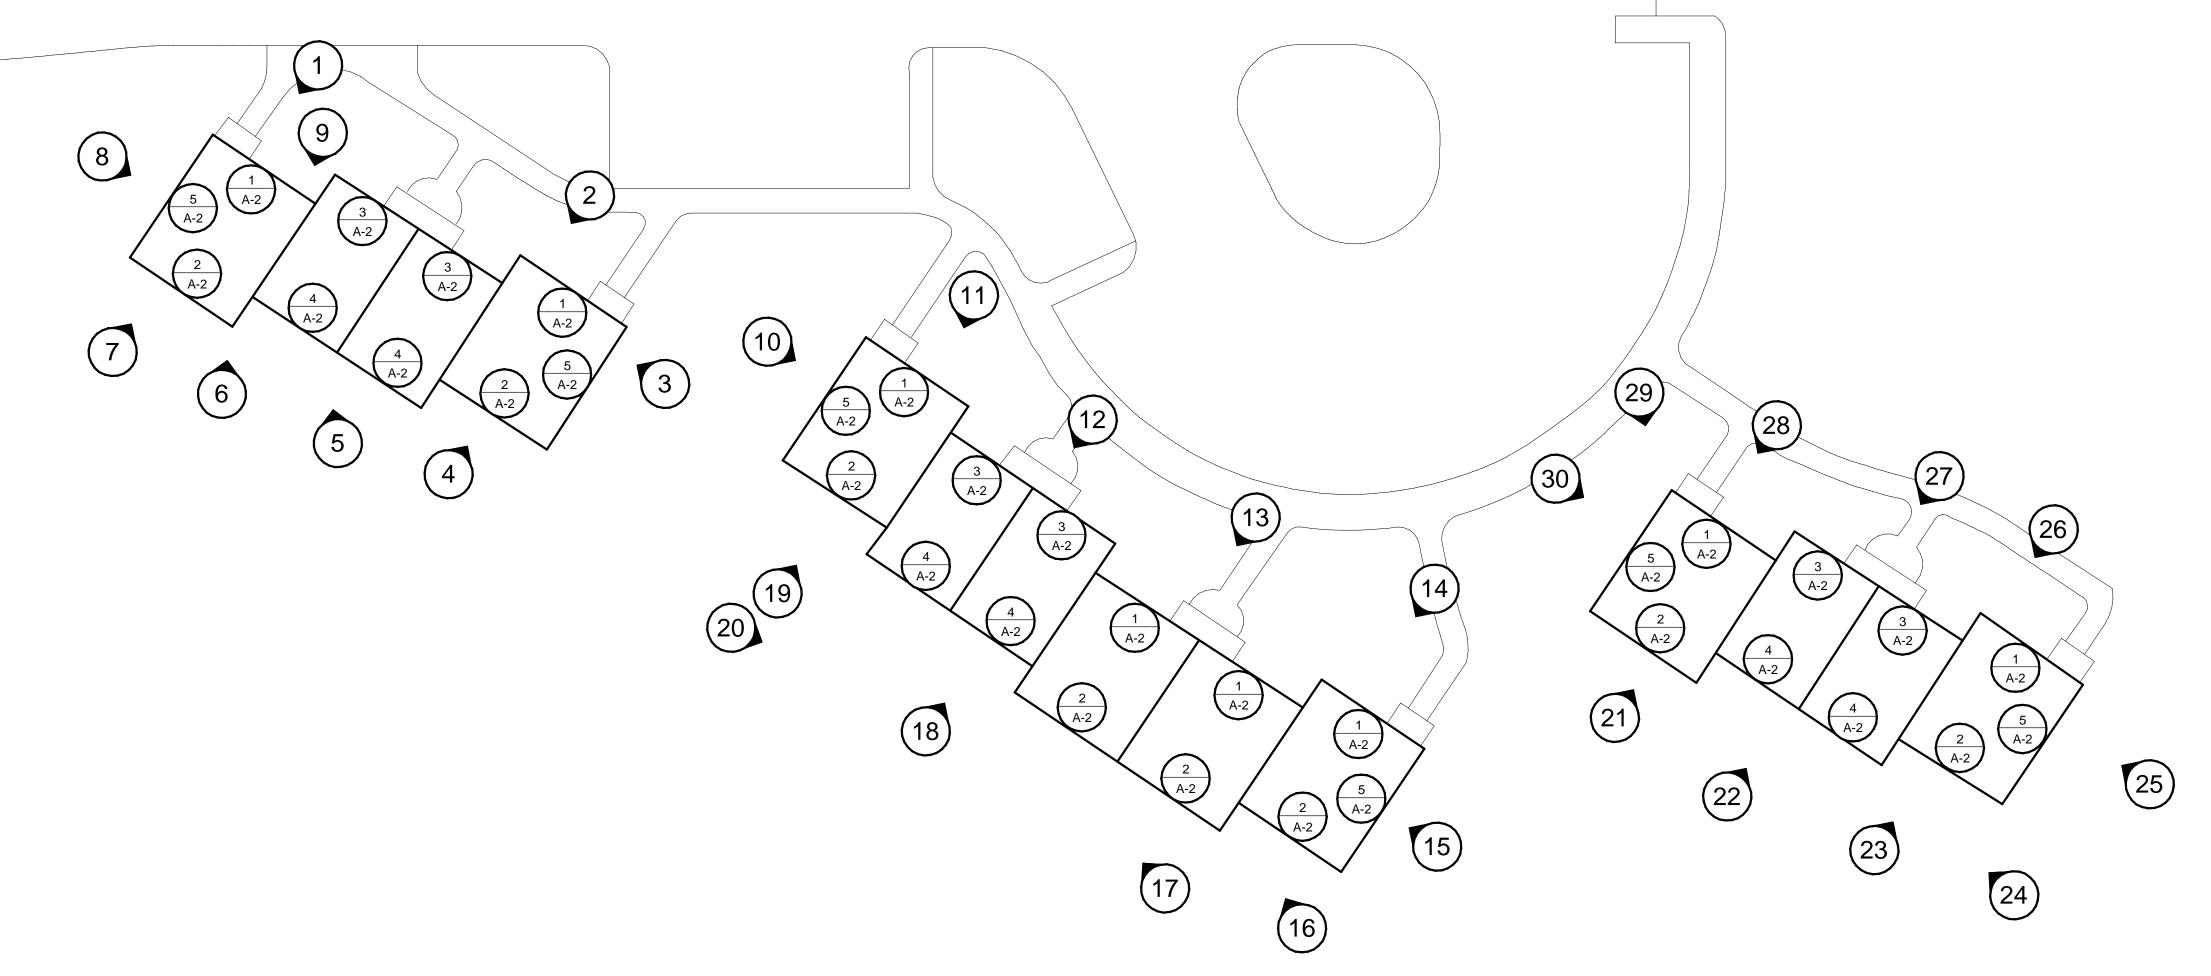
PHOTOS REFERENCED ON THE EAST PAGES LANE SITE KEY PLAN ARE LOCATED ON SHEETS P-3A, P-3B, AND P-3C
